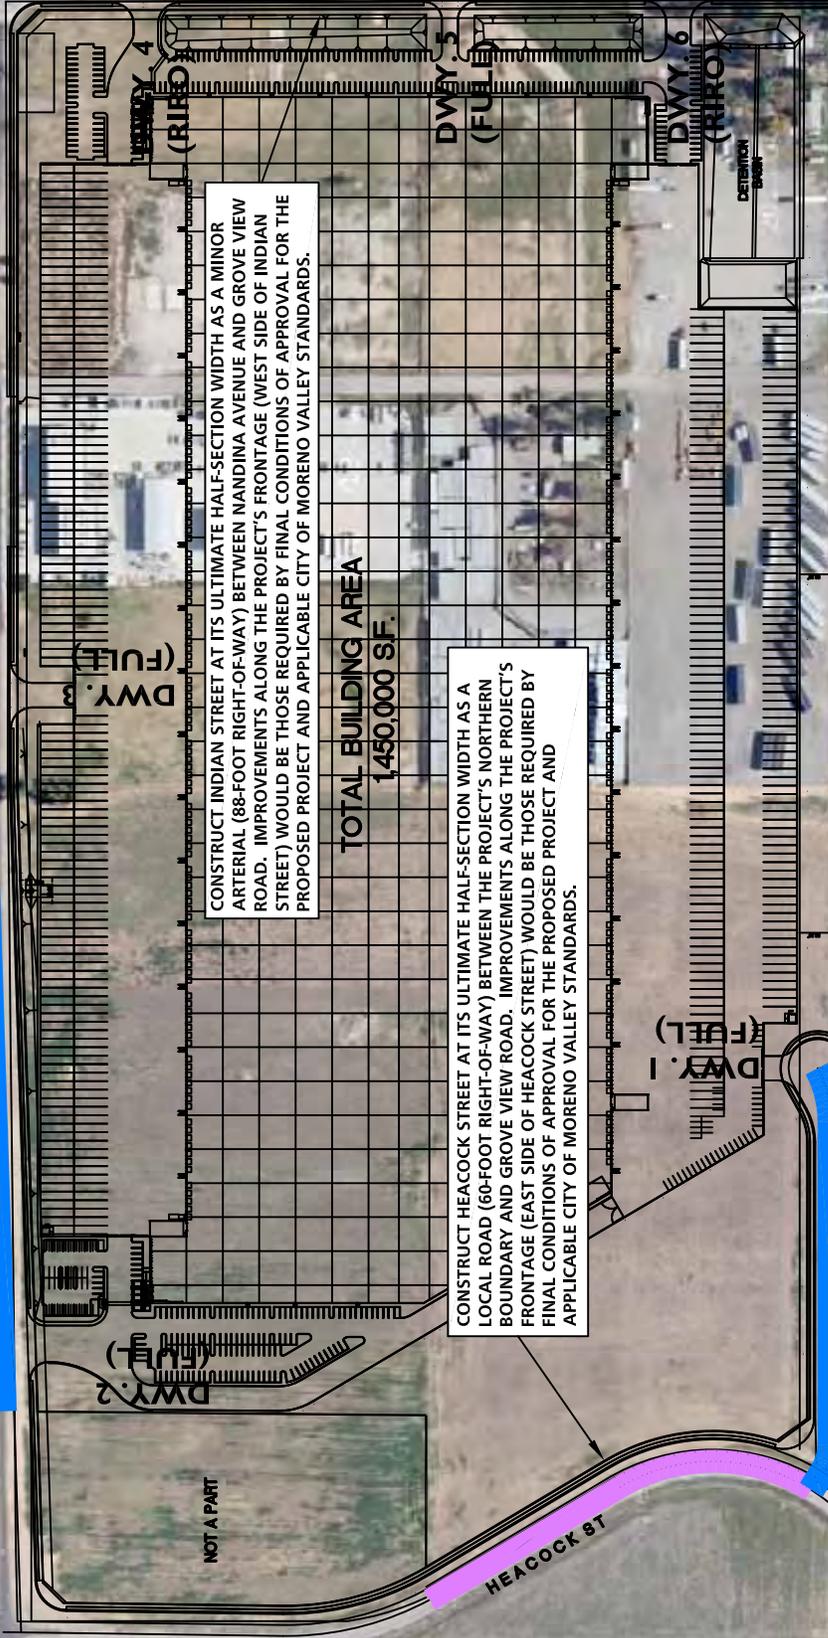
SITE ADJACENT ROADWAY RECOMMENDATIONS
